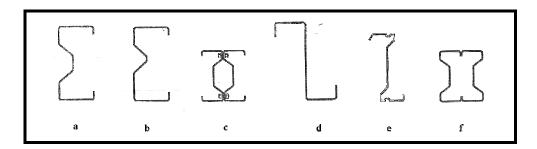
Typical cold rolled steel sections (Owens, 1992:429).
